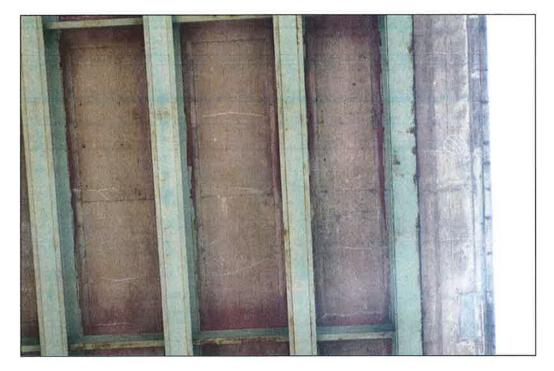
Typical Condition of Soffit (Bent 85-86) (fair condition – stained and unstained cracking, delaminations and patches)
